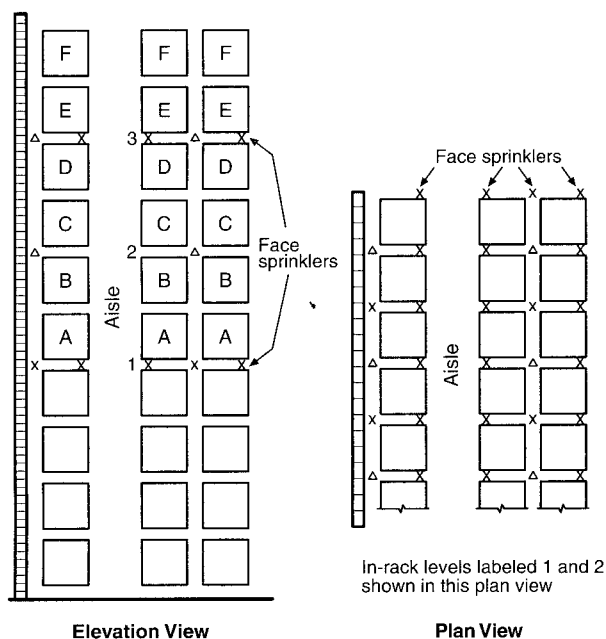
(c) In-rack sprinkler arrangement, Class I, Class II, or Class III commodities, storage height 25 ft to maximum 30 ft (7.6 m to maximum 9.1 m).
